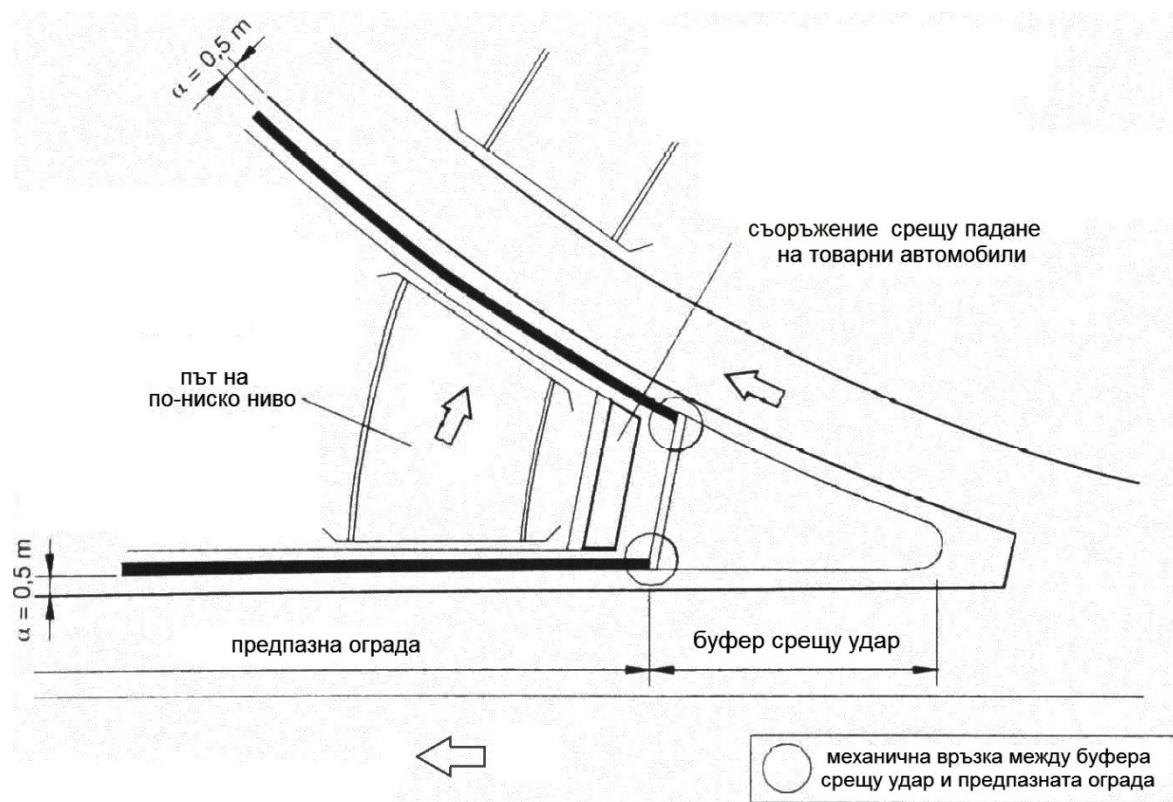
Shock absorbing buffer against impact on the tip of a dividing island on a bridge
